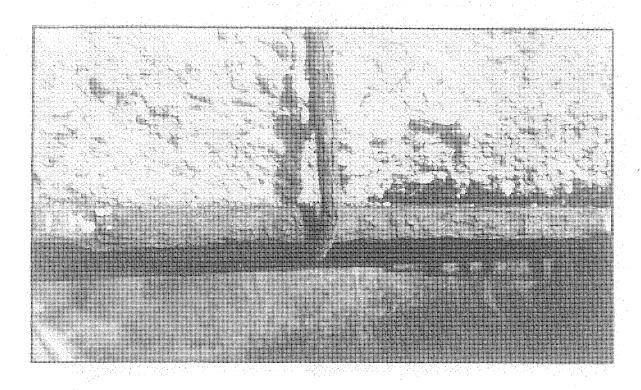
Exposed 1-1/4" Square Reinforcing Steel. Beam 9, Span 2.
